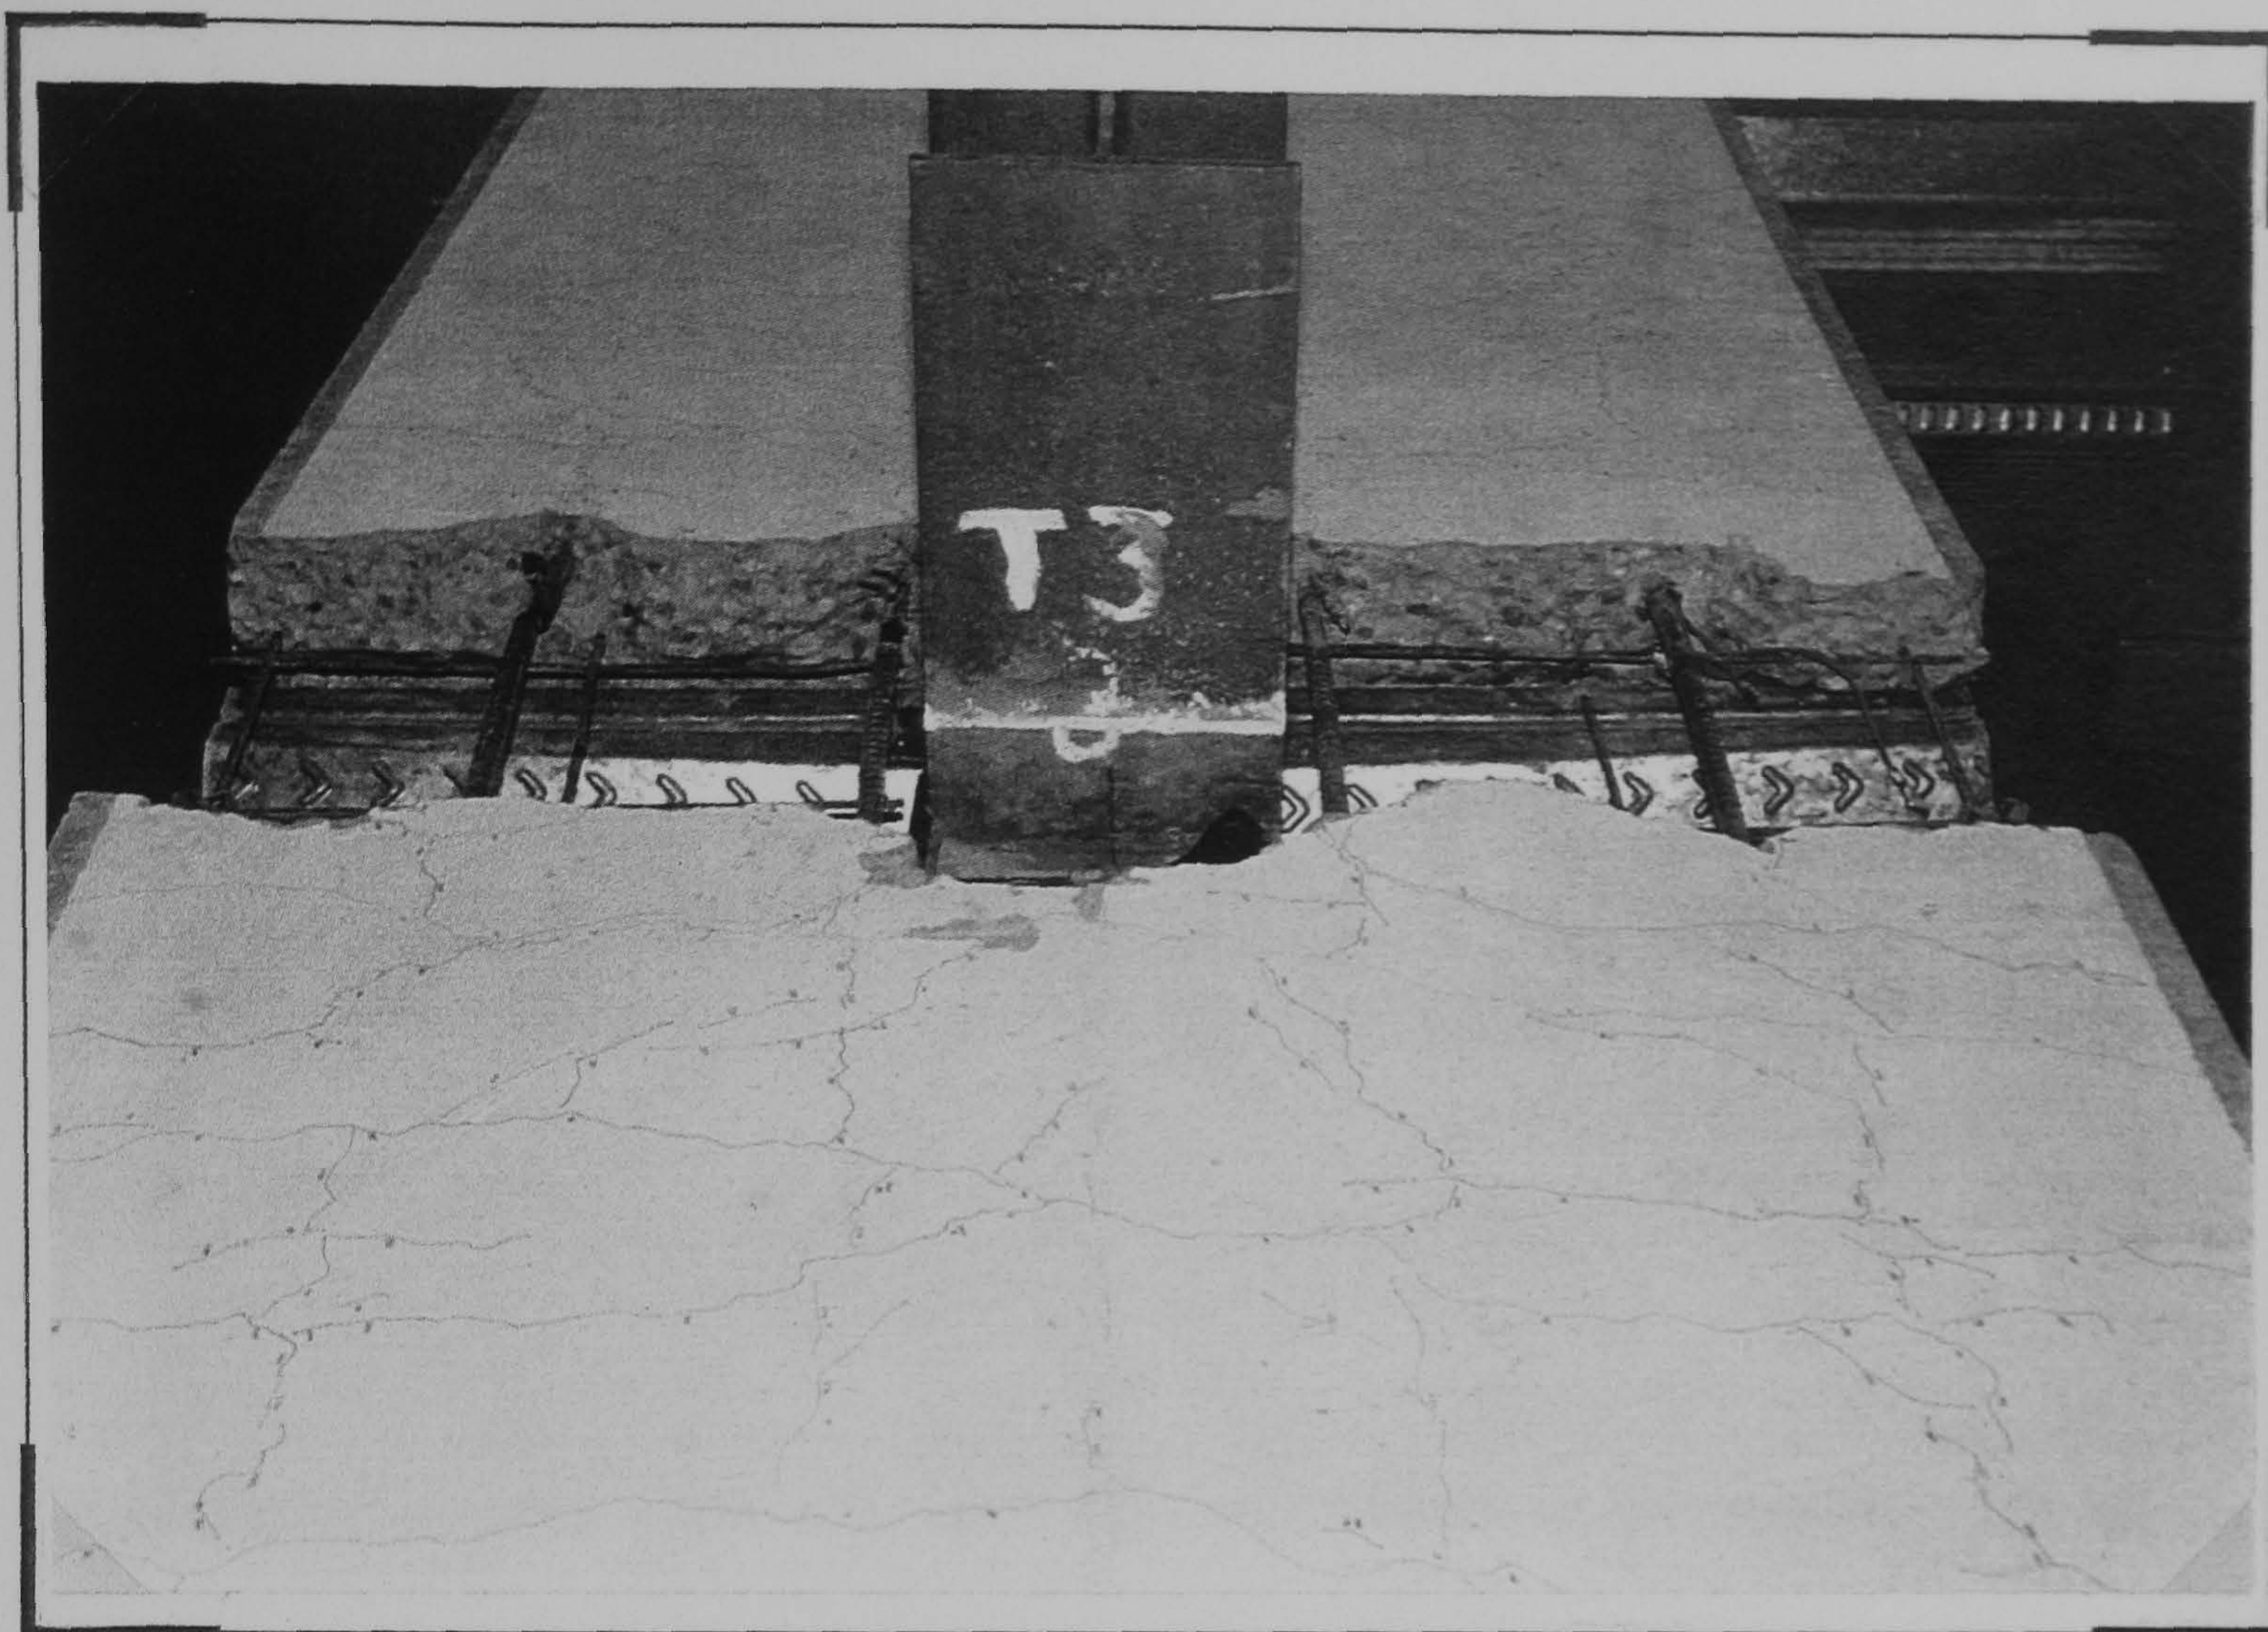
Test 3: lateral deformation of the reinforcement
